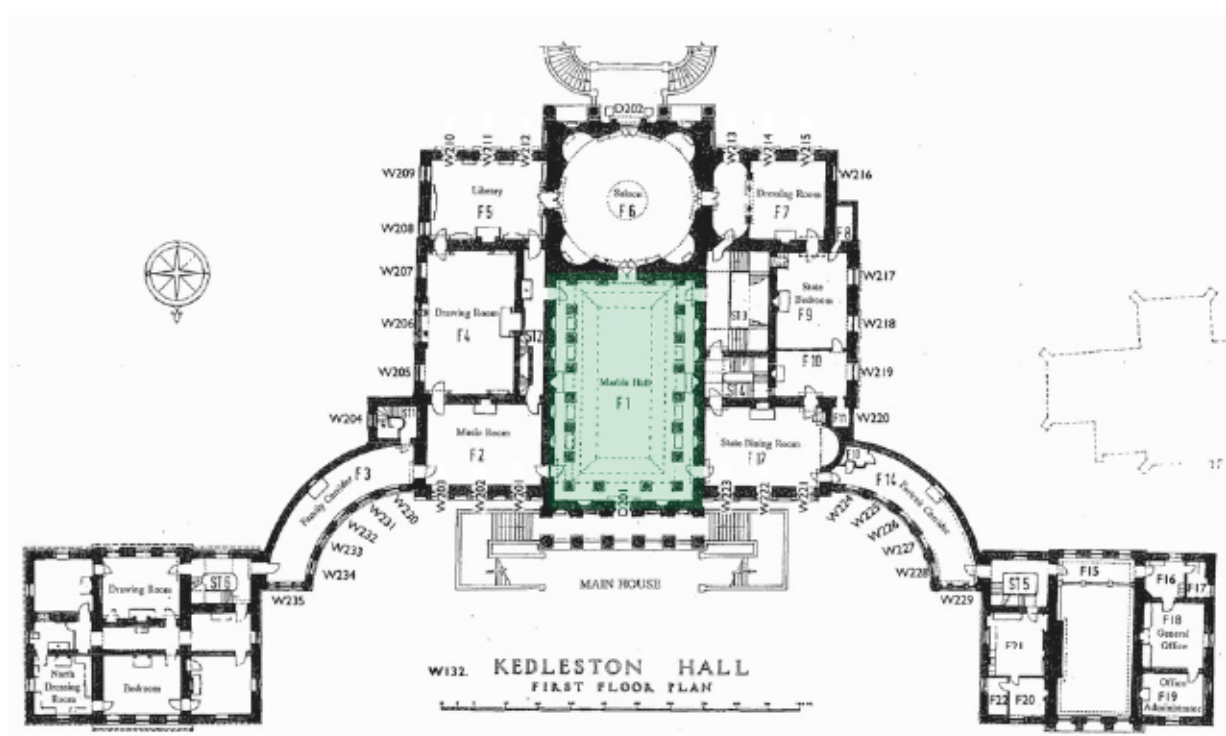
Plan of Kedleston Hall with location of the Marble Hall highlighted in green
